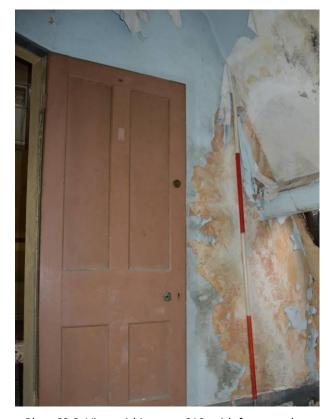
View within room S10, with four panel door. Scale 2m. Facing south west.
